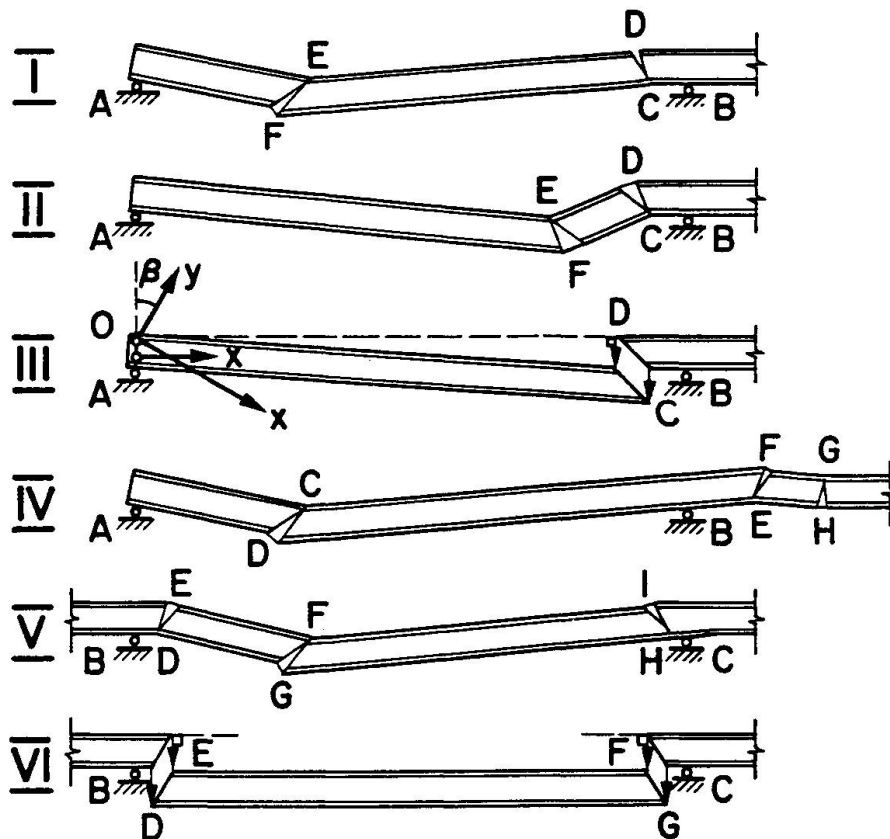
Failure mechanisms for continuous girders [20].
